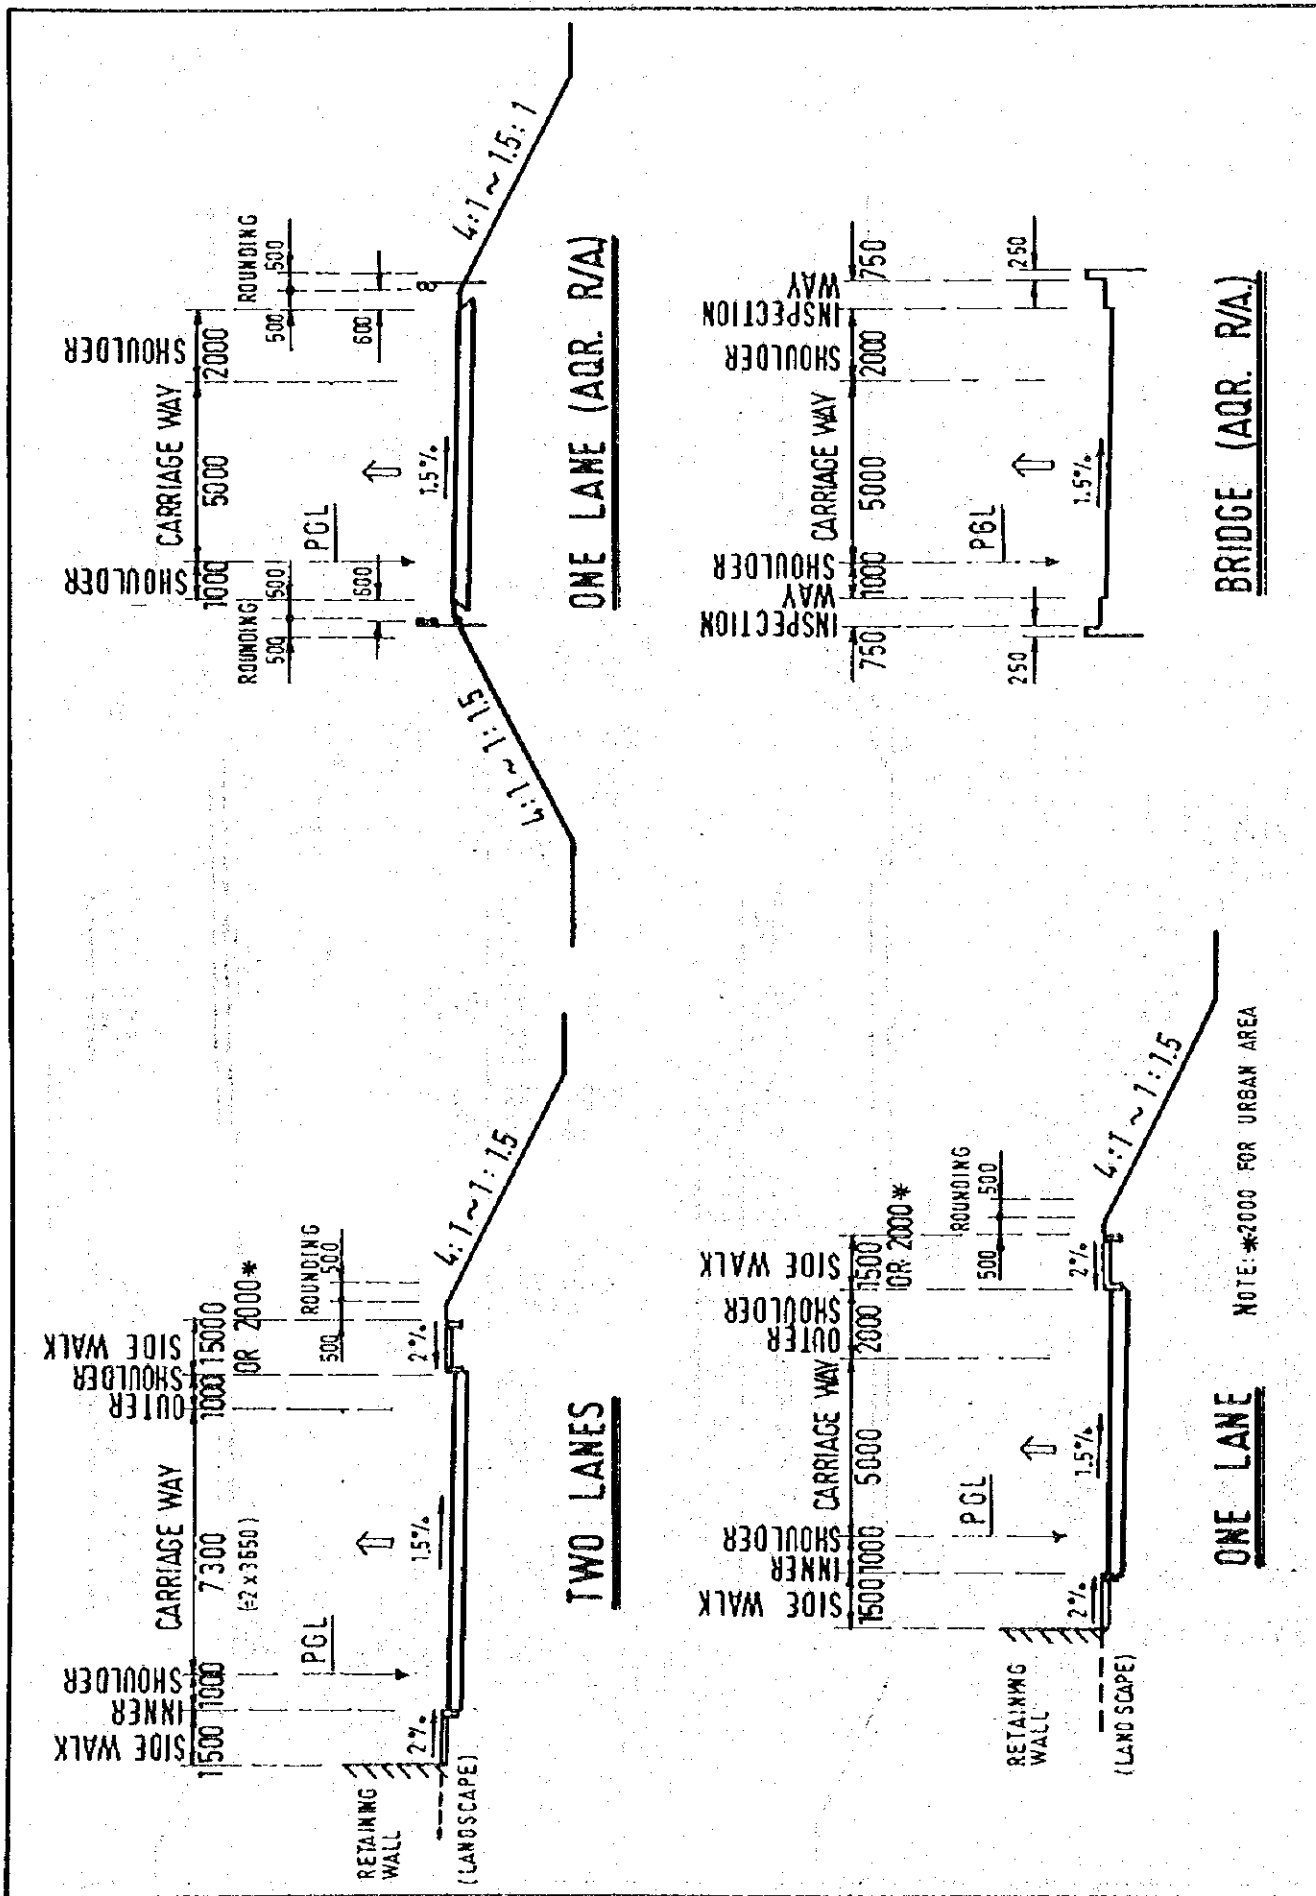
Cross-Sectional Details of Proposed Rampways
